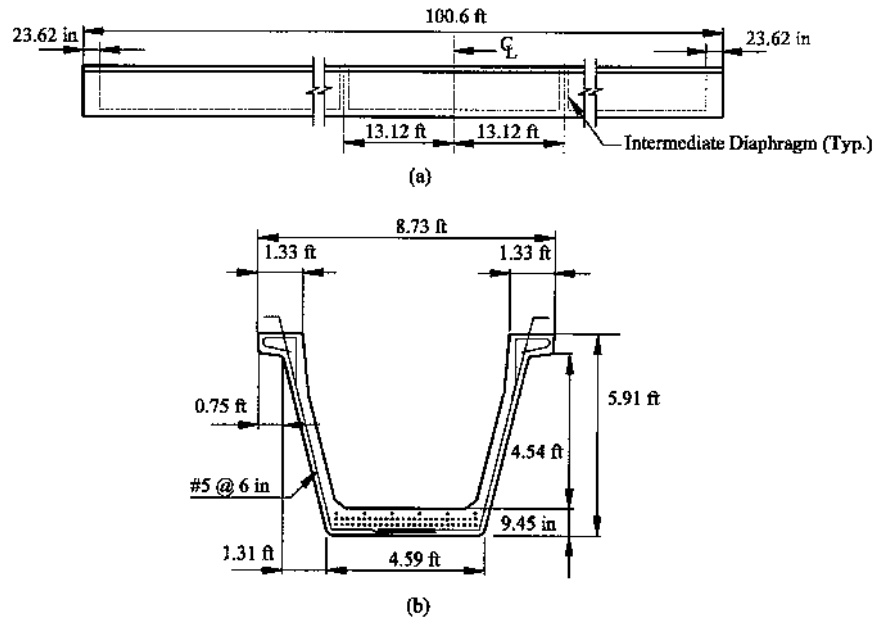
Dimension of U-beam, (a) Elevation, (b) Typical Section
